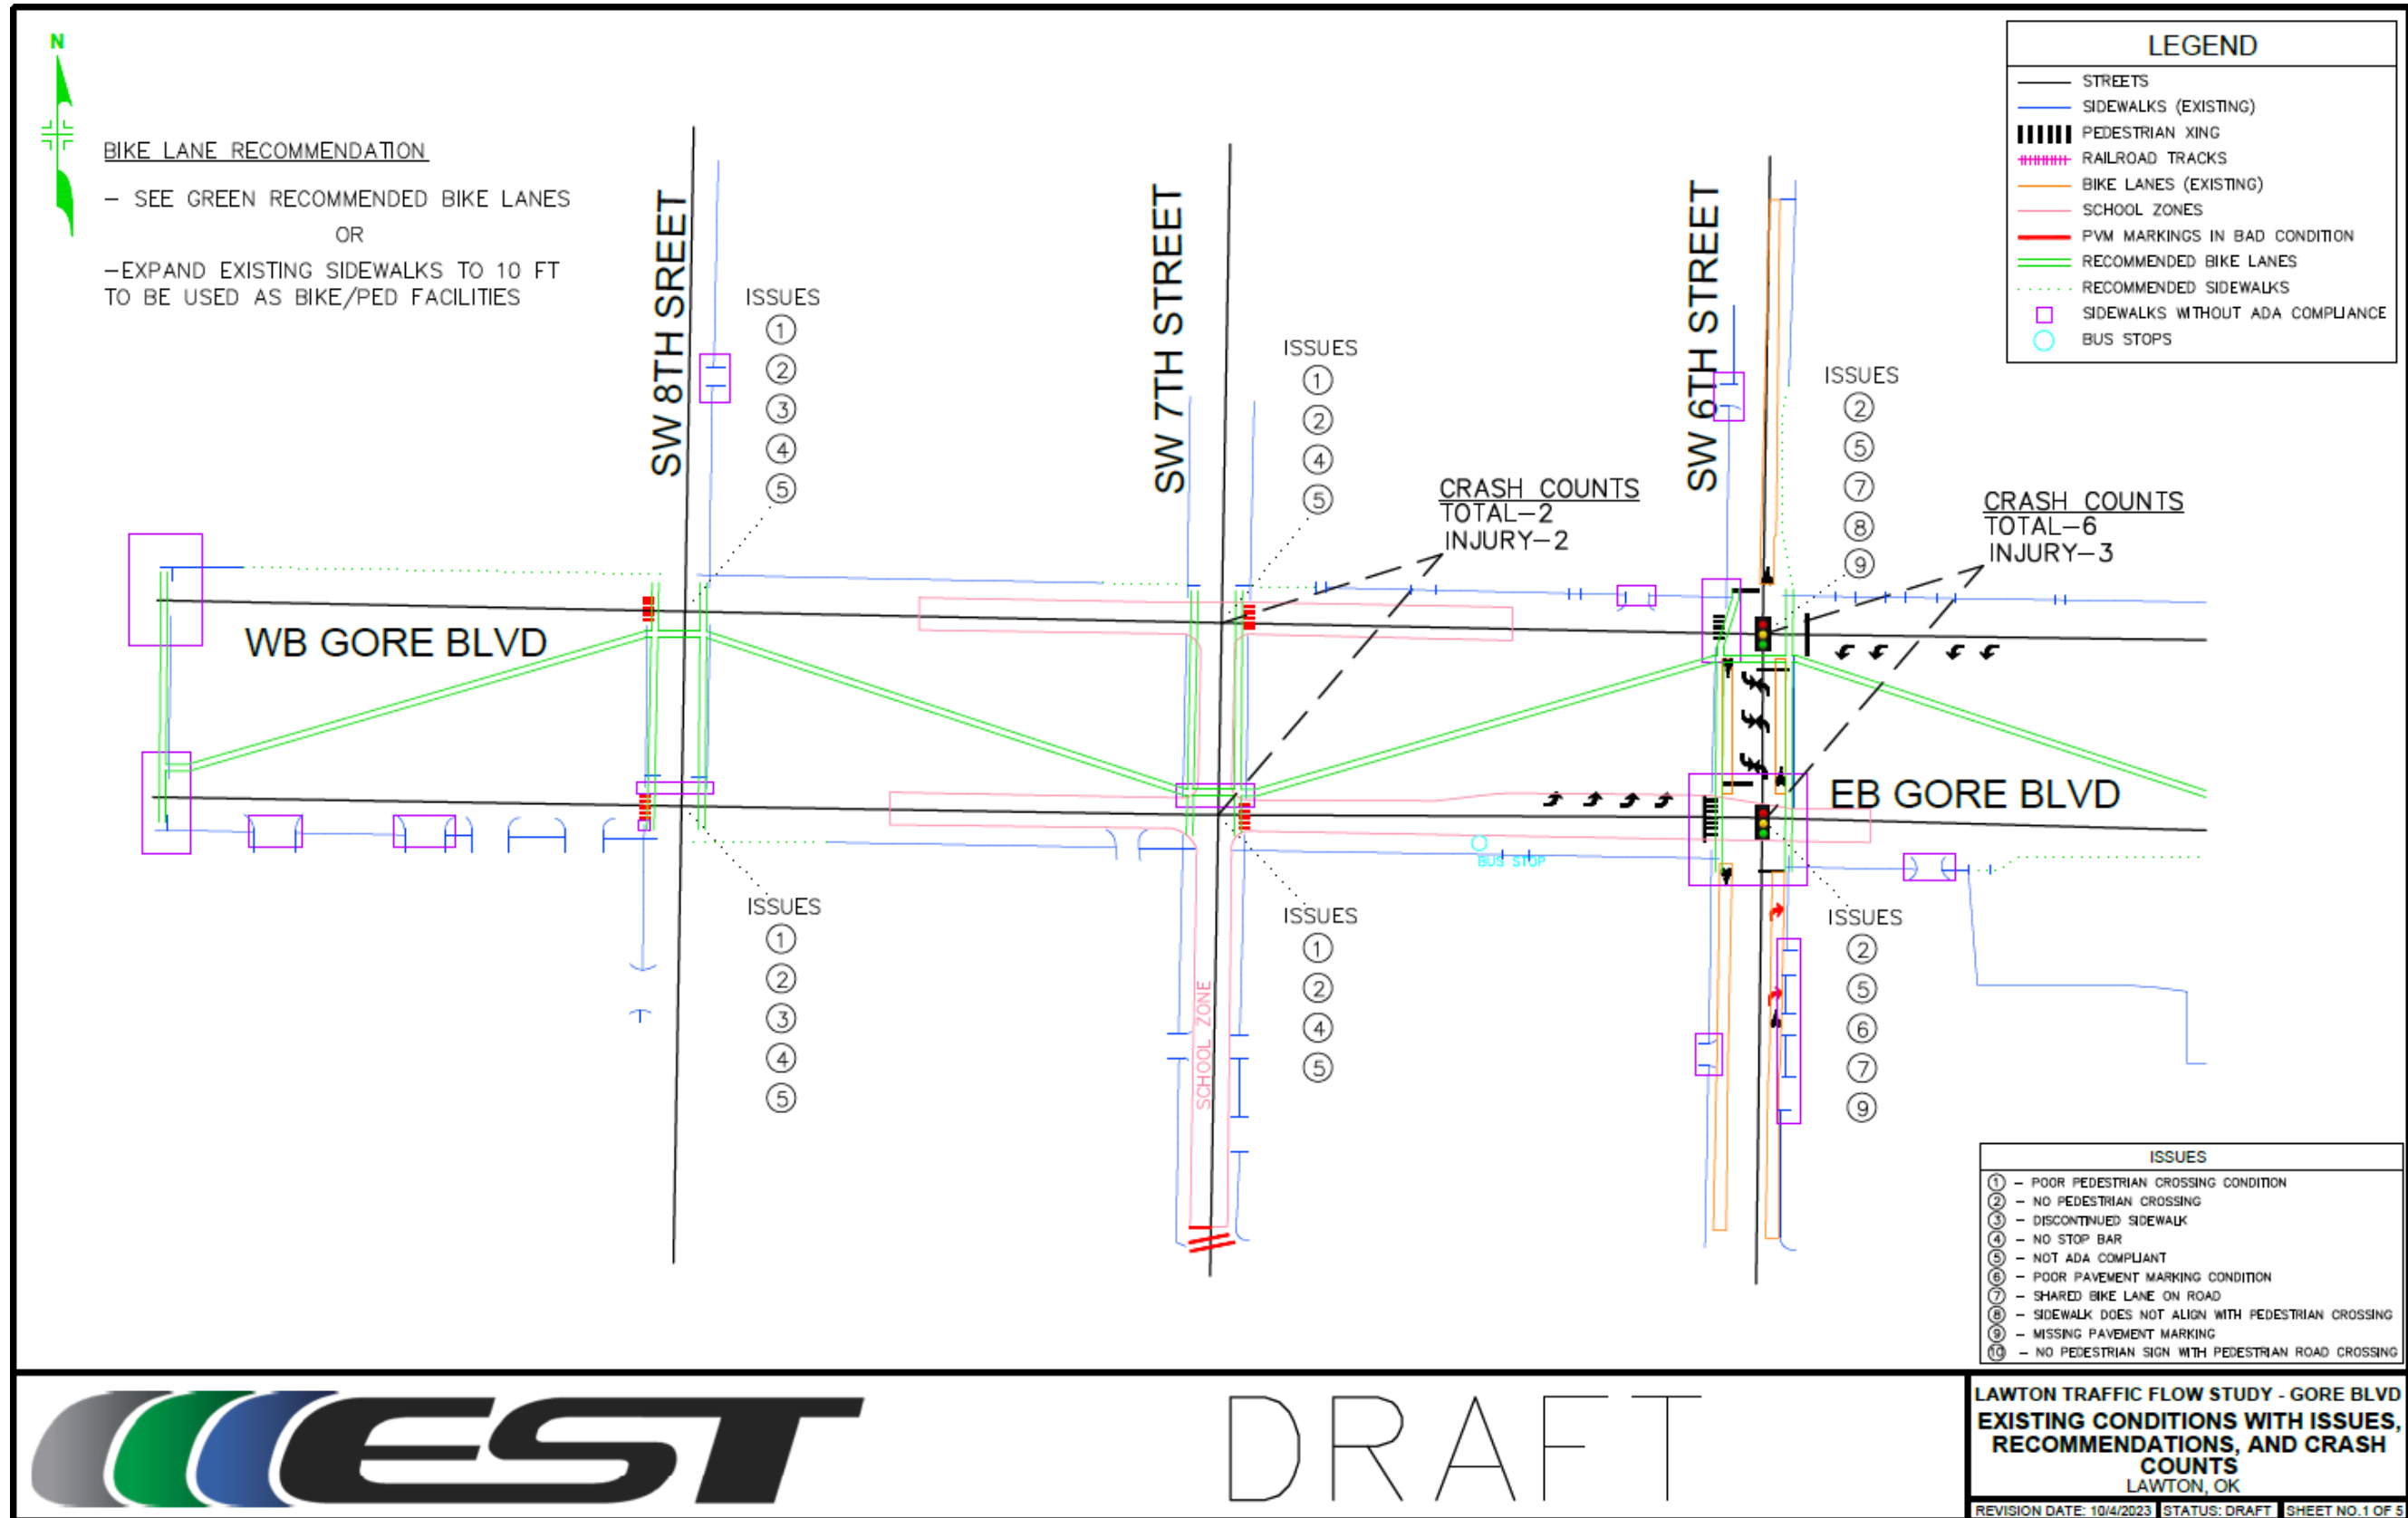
Issues & Recommendations Along Corridor (page 1/5)
